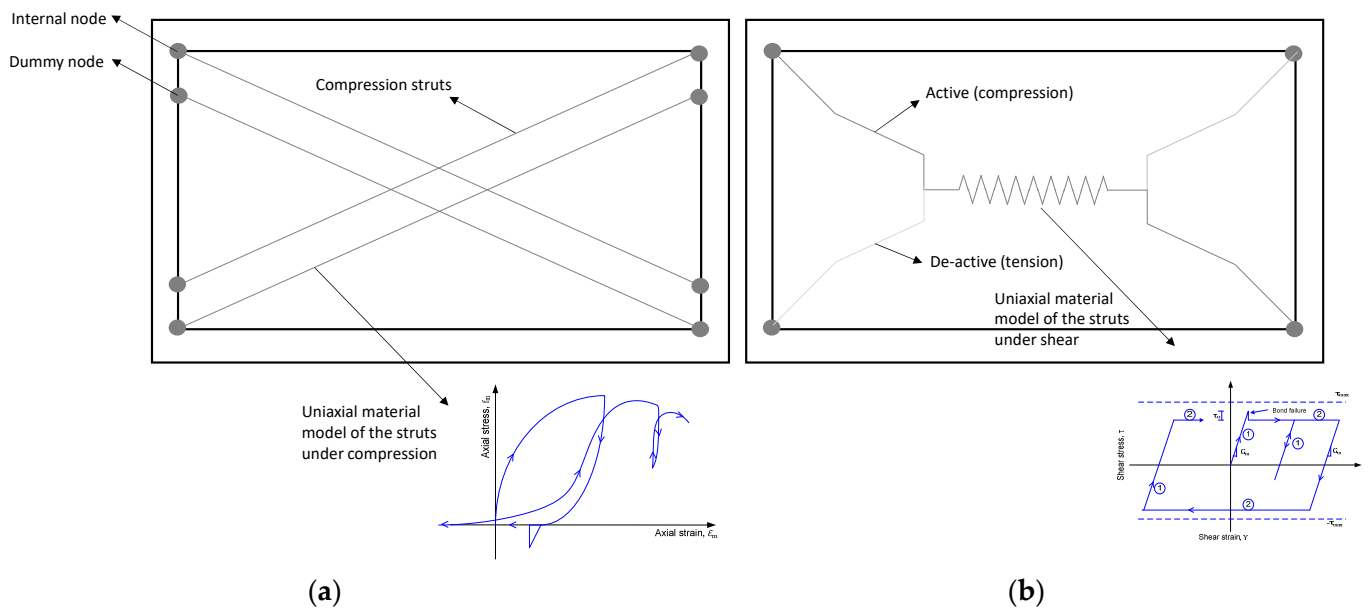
Modeling strategy adopted for the masonry infill walls: (a) under compression; and (b) under shear.
